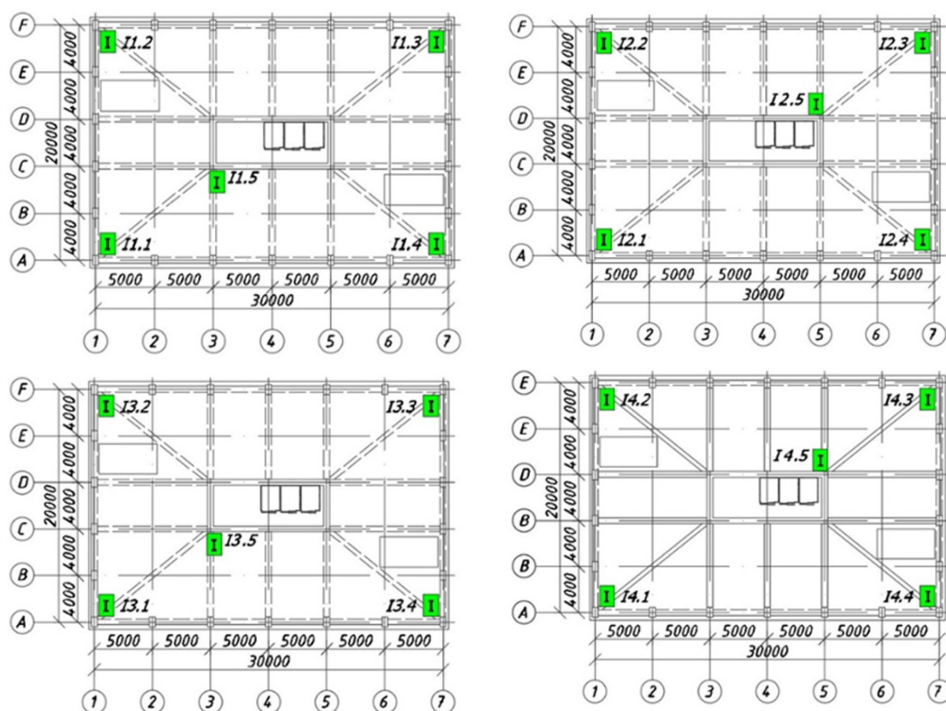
Location of inclinometers for a box-stem structural system with outrigger floors on 6, 12, 18, 23 floors
